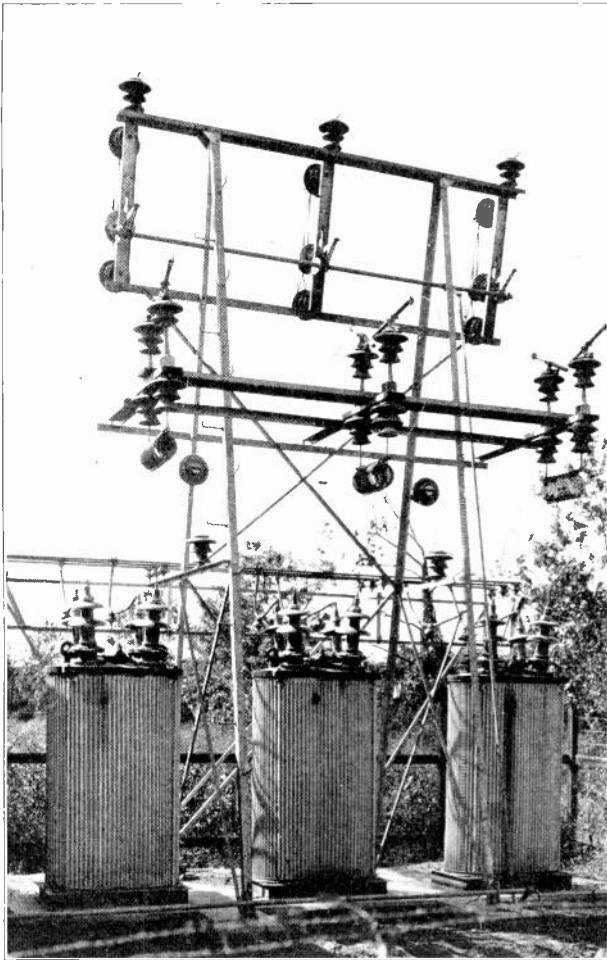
Small outdoor transformer substation with transformers located on a base on the ground, and choke coils, fuses, and disconnect switches on the steel tower above them.
